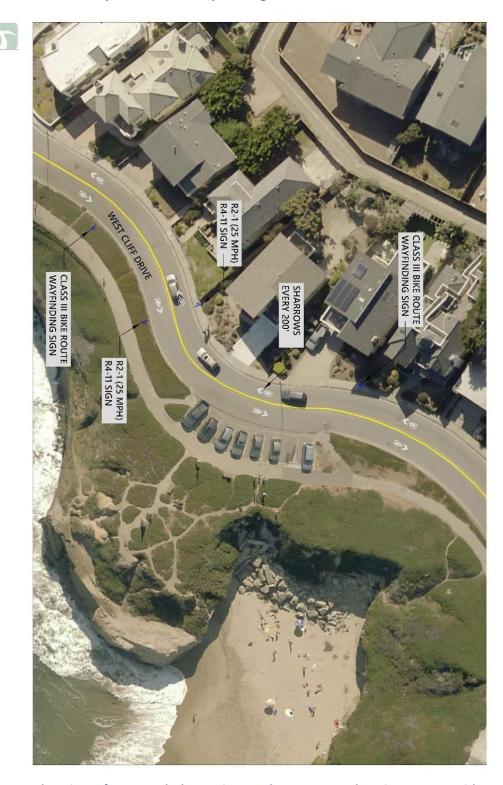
Plan view of Proposed Alternative 1 Enhancements Plan view at Pyramid Beach parking lot
